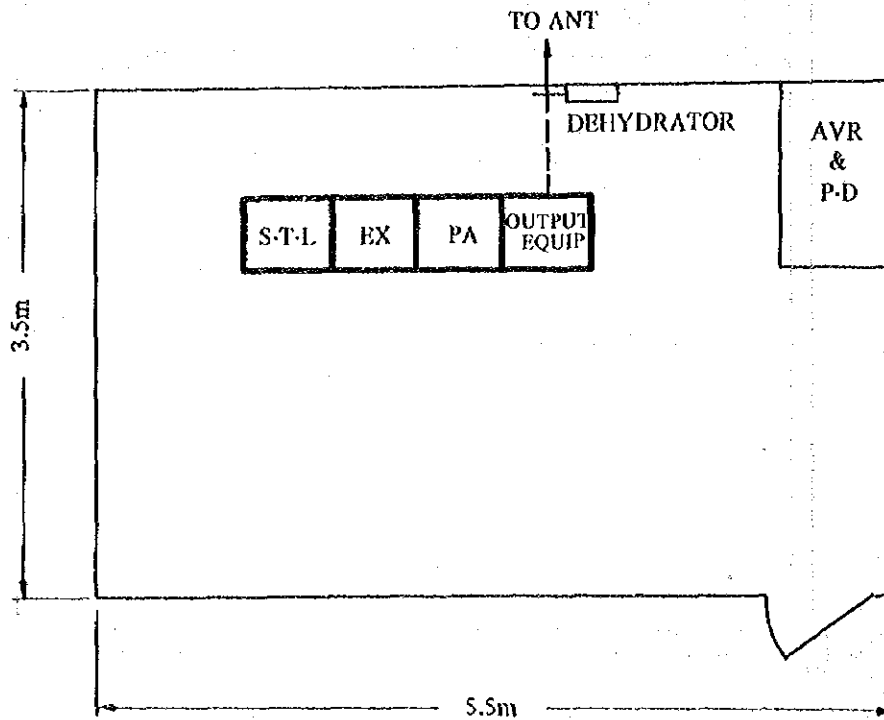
Floor Layout of 300W TV Transmitting Station
